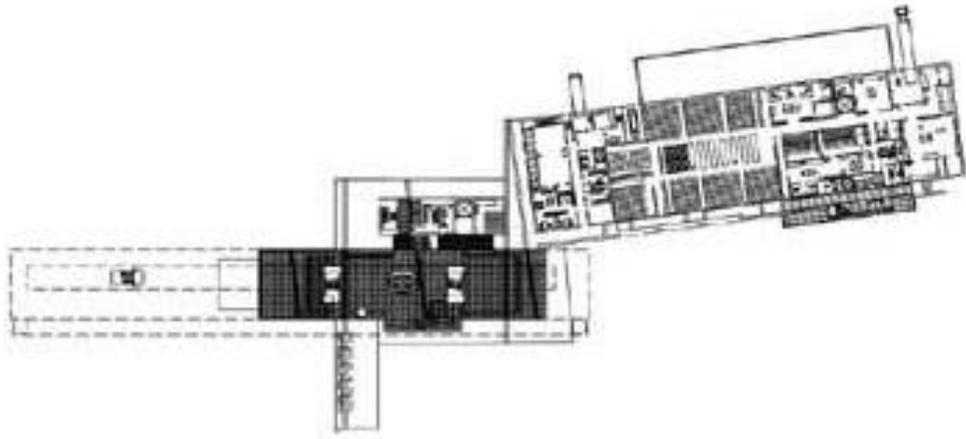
Ground floor plan of the William J. Clinton Presidential Center, the bridge building is on the left.
